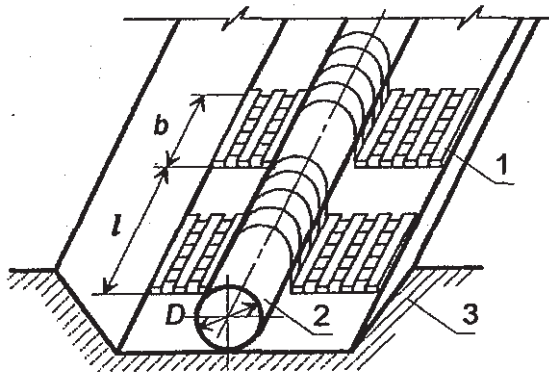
Pipeline stabilization with the rubber-cloth anchor arrangement.
